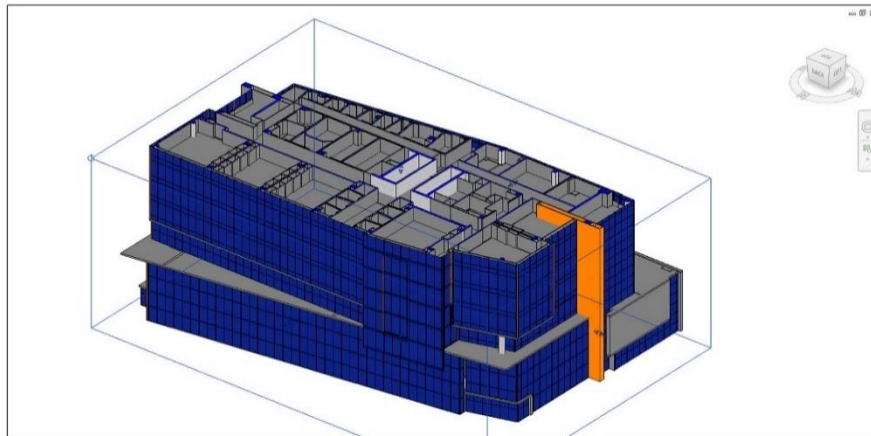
The MB BIM Model Façade, Plan Details and Floor Heights
